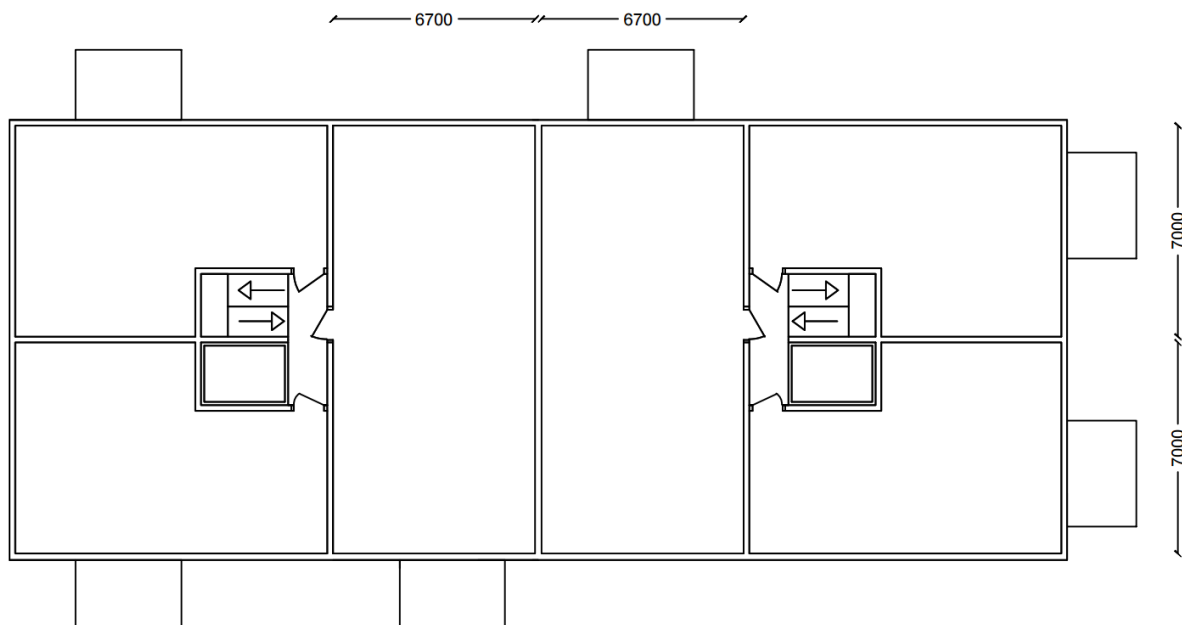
The floor plan for storey 2-5. Only load bearing walls are illustrated and all measurements are in millimetre.
